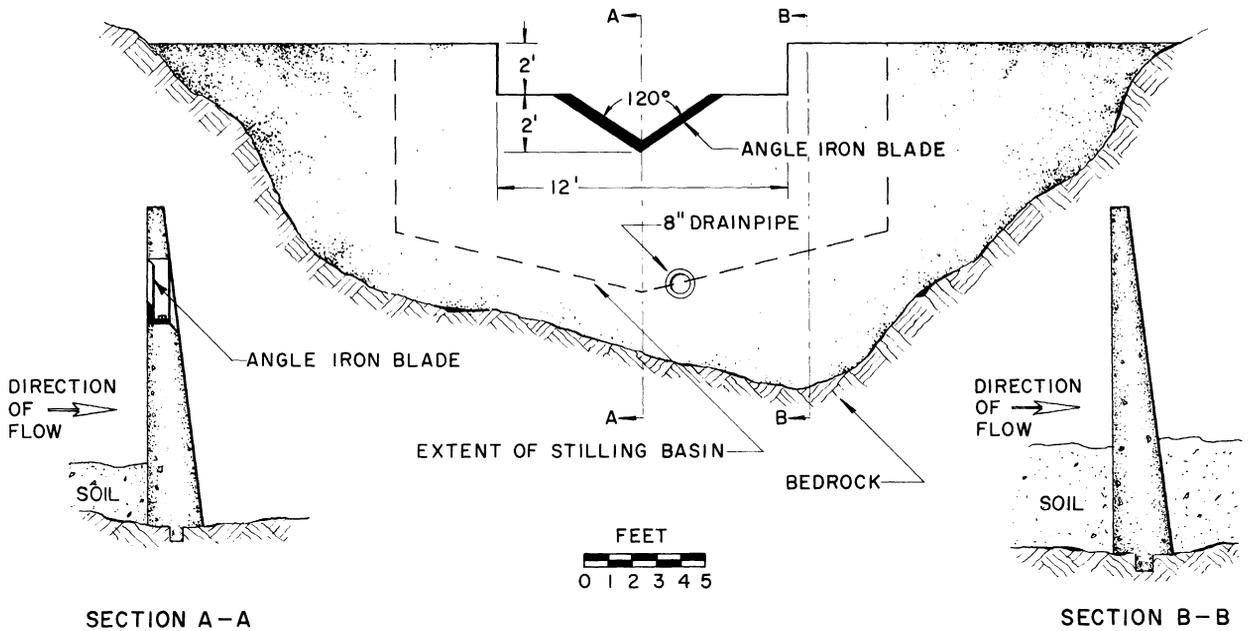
Plans for concrete cutoff wall constructed at Fernow Experimental Forest, Parsons, W. Va.
